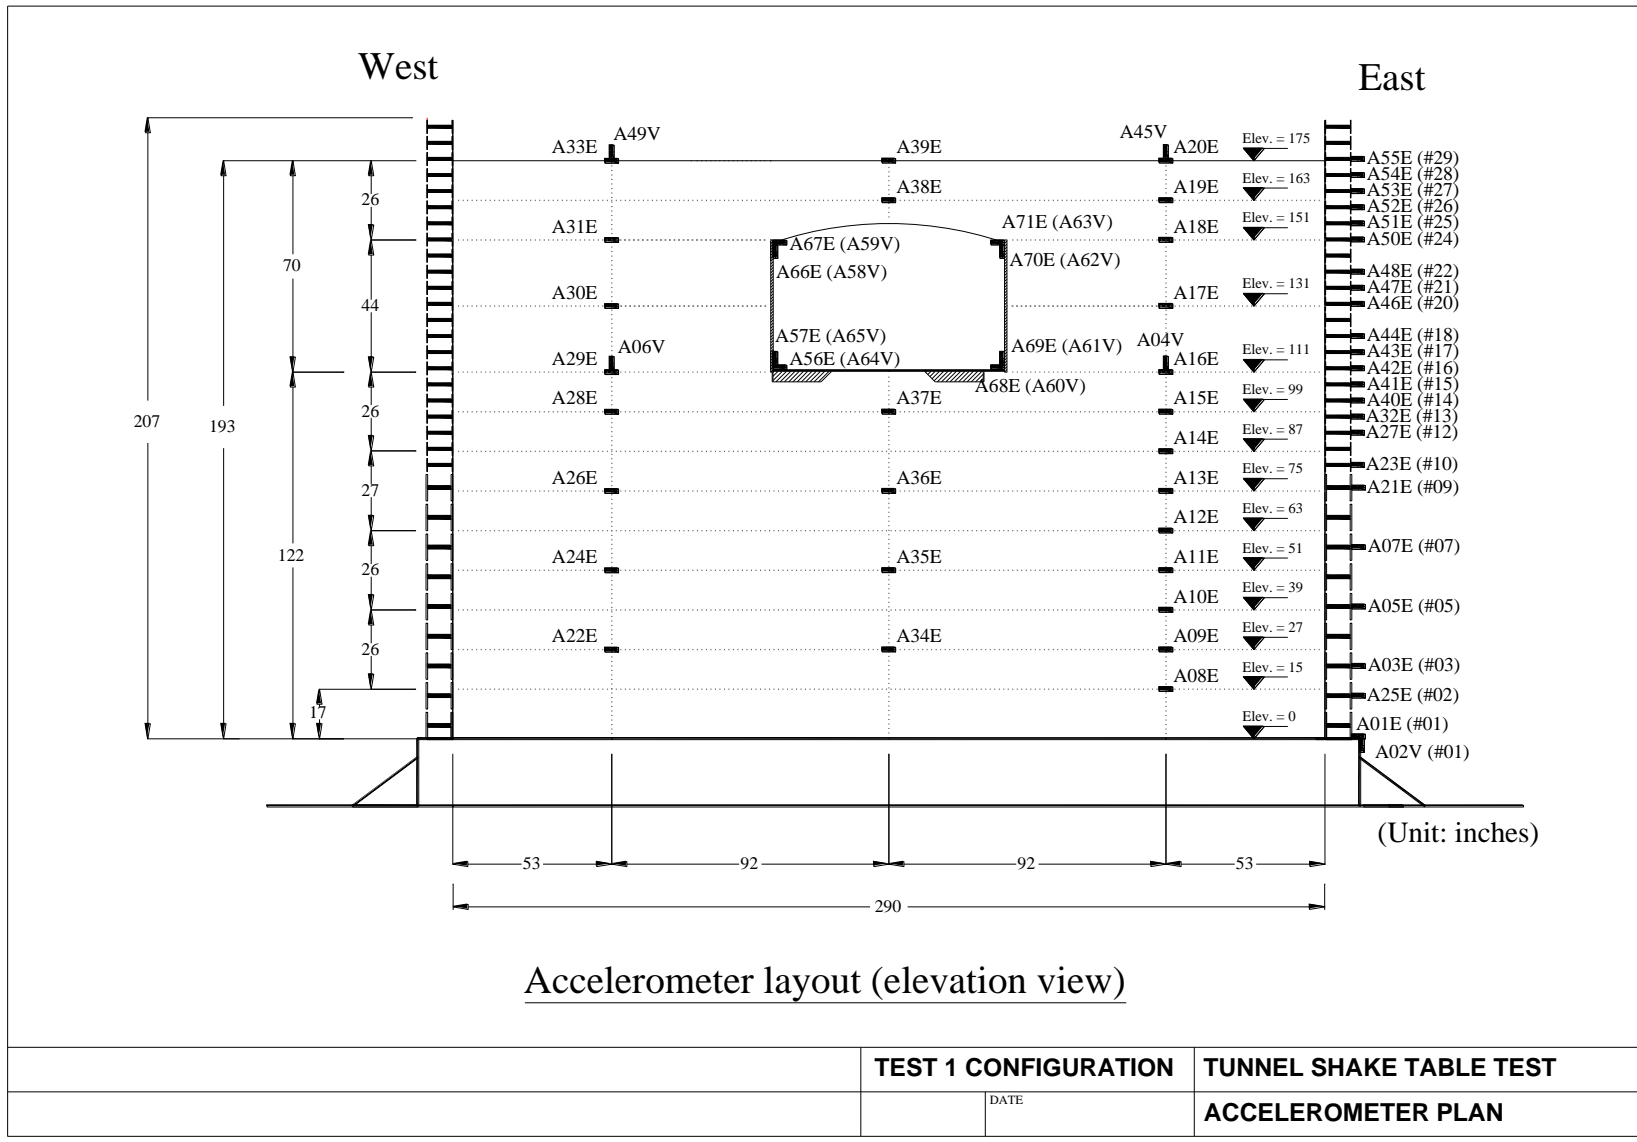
Elevation view of accelerometer (A) instrumentation plan for Test Model 1
